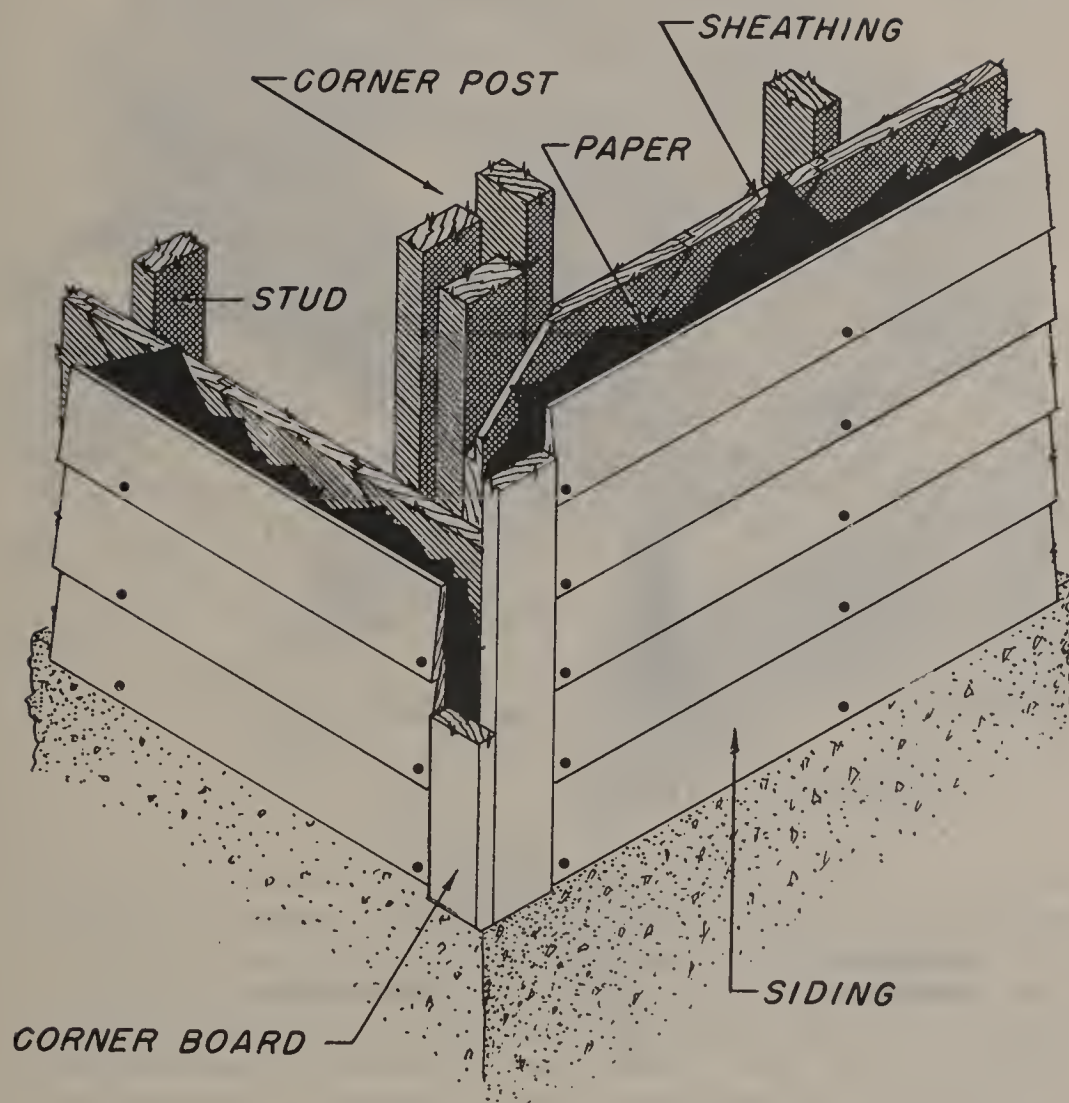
Bevel siding. Face-nailed to each stud with two eight-penny rust-resisting casing nails driven through overlap of siding and through sheathing into each stud. Siding nails should be set and puttied. Note: If necessary, to prevent splitting holes should be bored for nails near ends of pieces of siding.
